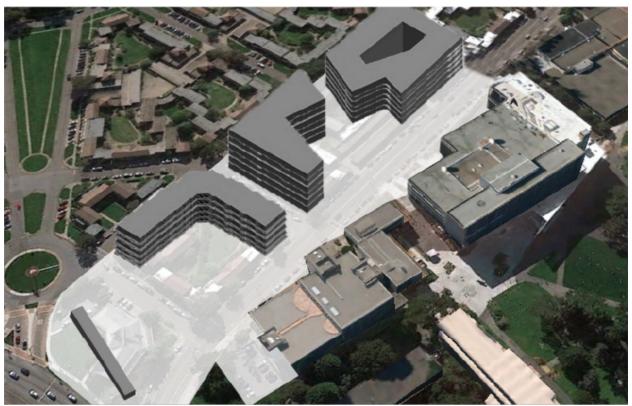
Three new mixed-use buildings along Holloway Avenue take on unique shapes to complement the existing built environment.
